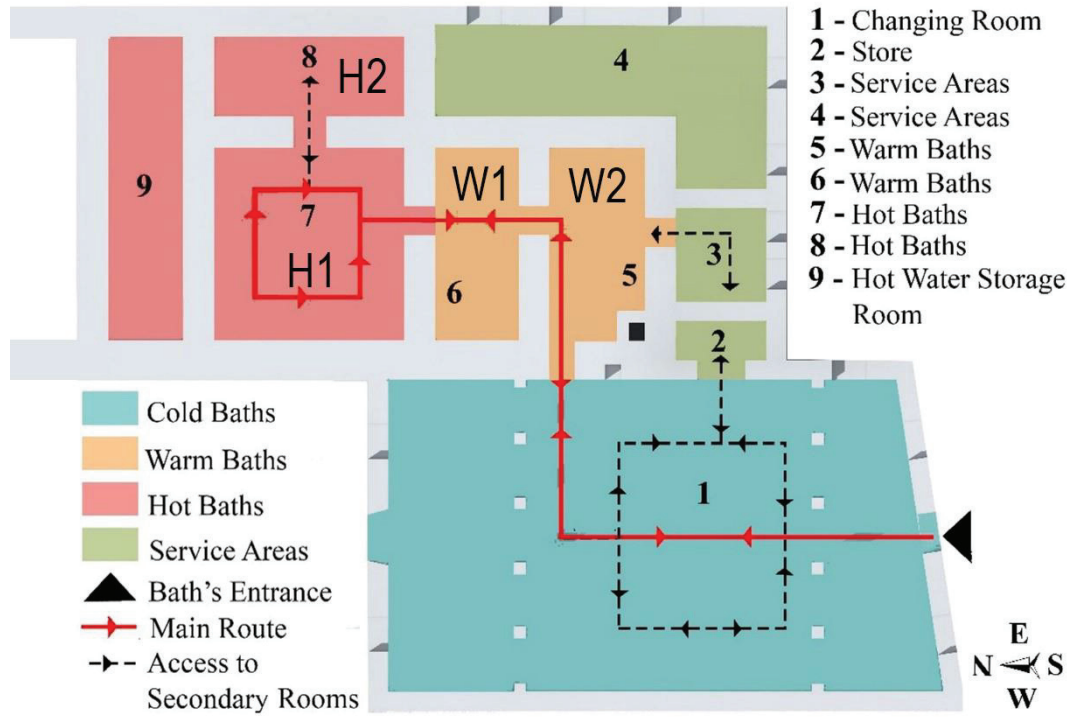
Schematic plan of the the Alibey Bath and routes.
